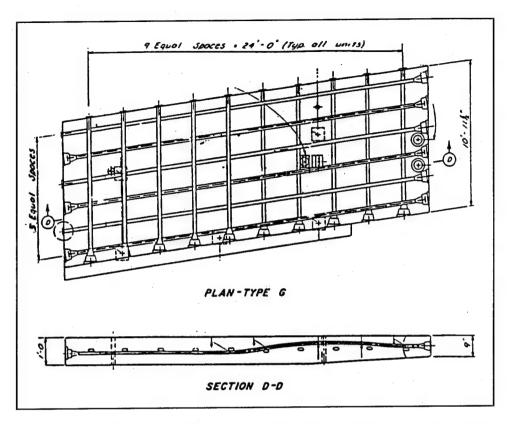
Panel prestressing layout, Dublin Scioto Bridge (from PCI 1988)
